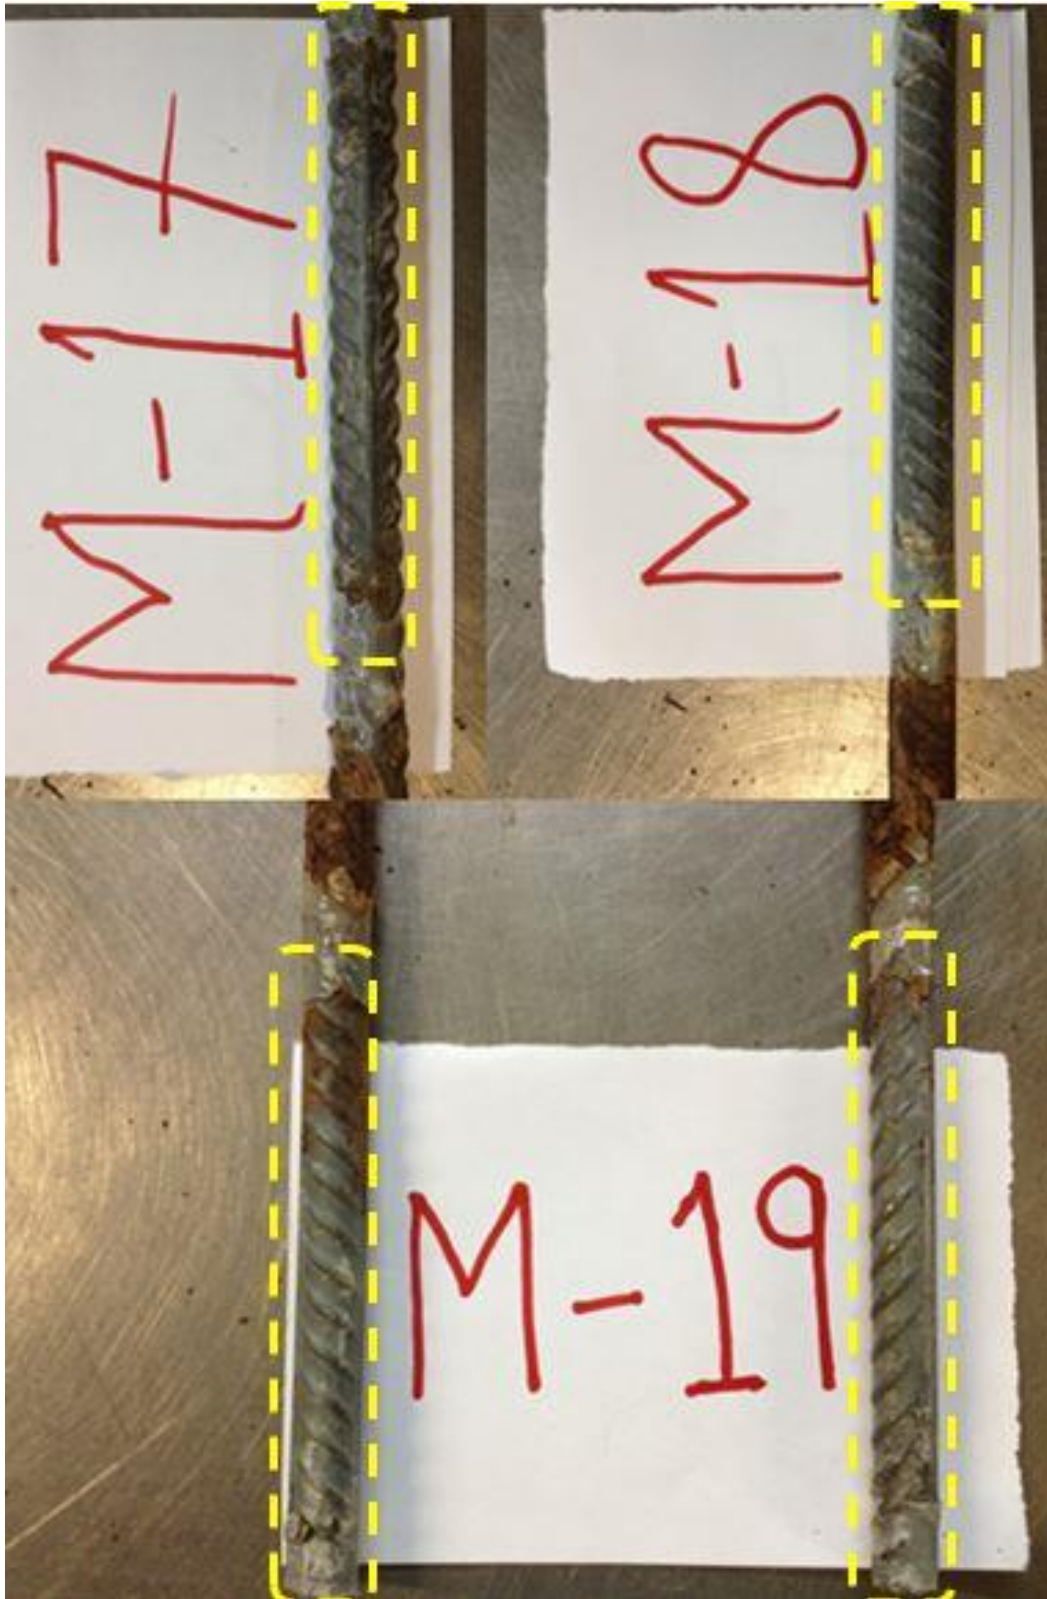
Highlighted portion of the rebar was embedded in concrete (Mixes no.9 to 12)
